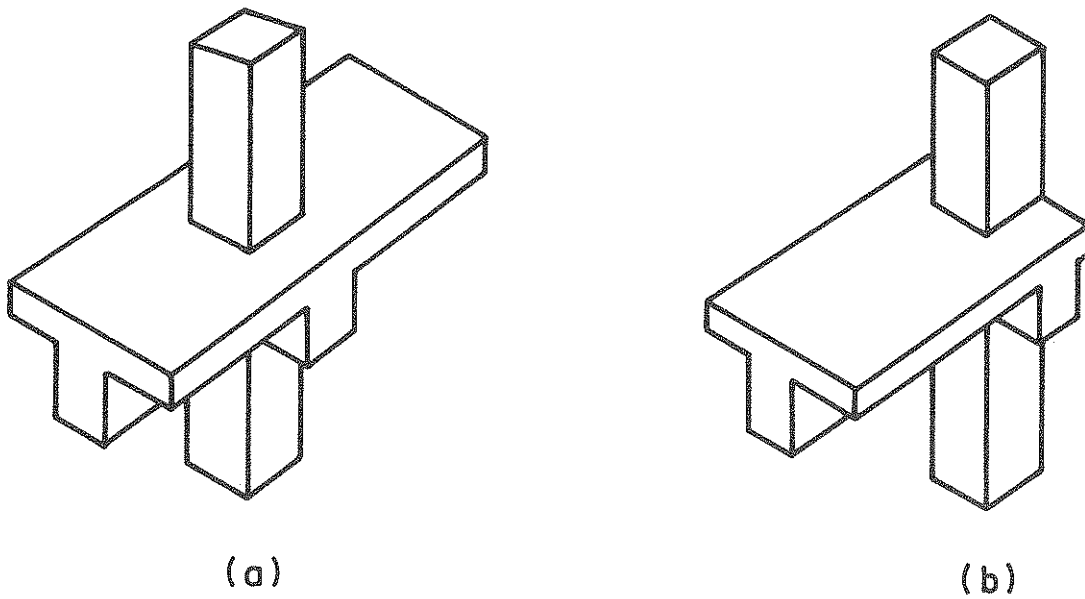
Specimens that include transverse beams and slabs: a) interior column; and, b) exterior column
